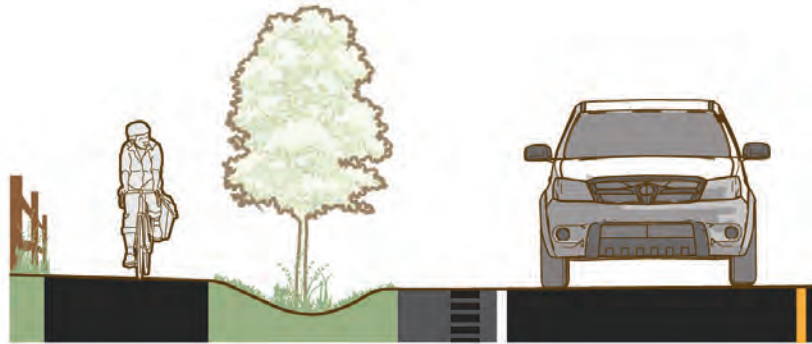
Separated bike lanes may be separated by an unpaved roadway separation, and a vertical element. When configured as directional facilities, separated bike lanes should be provided on both sides of the roadway.
